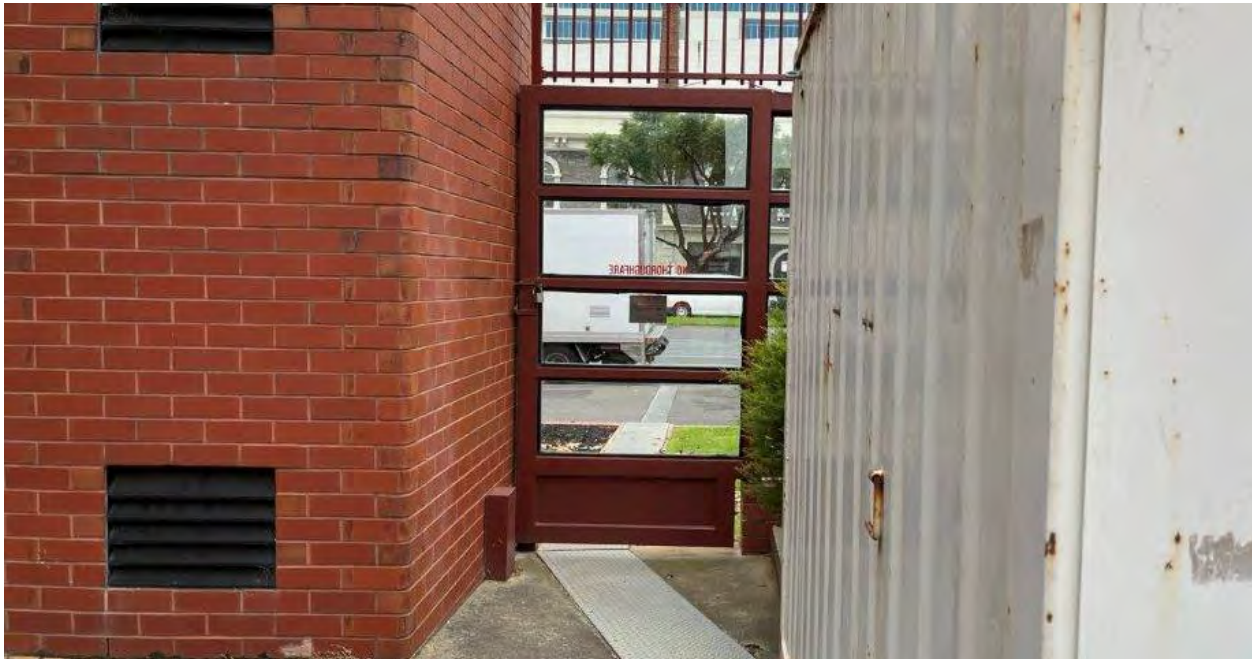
Location of site surface water (stormwater) discharge point to Wakefield Street, looking north
